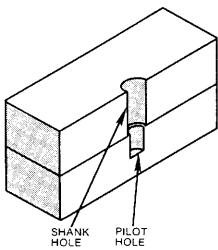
A screw usually requires a shank hole for the shank and a pilot hole for the thread. The shank hole should equal the gauge of the screw and go through the first piece. The pilot hole should be half the length of the threaded portion of the screw.
